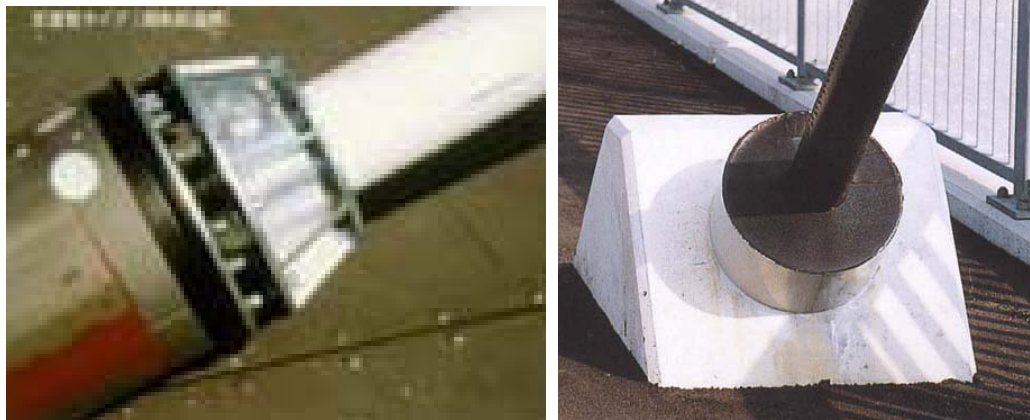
A picture of Rubber damper (left) and rubber damper installed on Tataru bridge(right)
